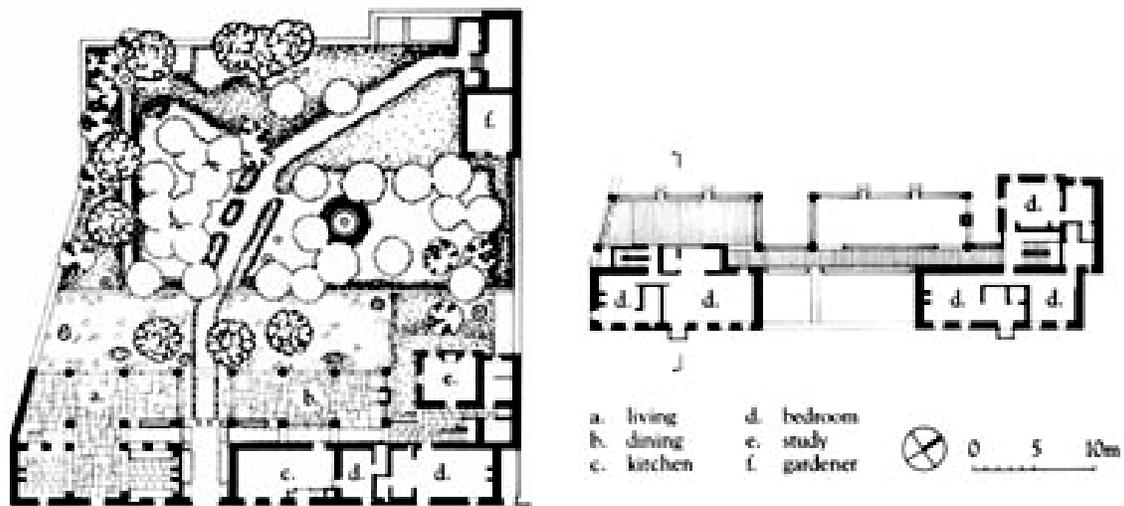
Ground floor and second floor plan of house (Holod & Rastorfer, 1983b)
